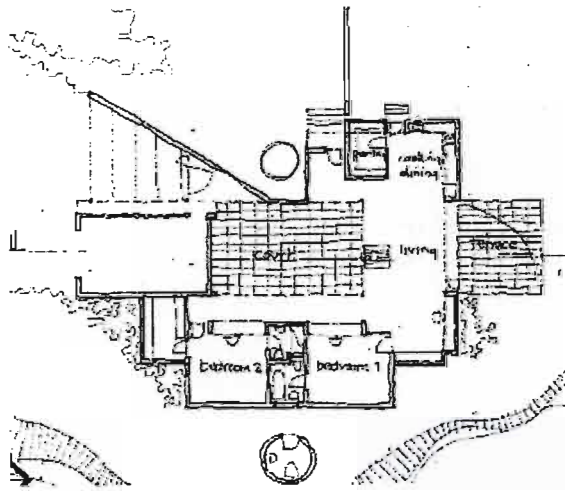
BDG – House Jordaan (1973). Plan. Drawn by D. Jordaan
